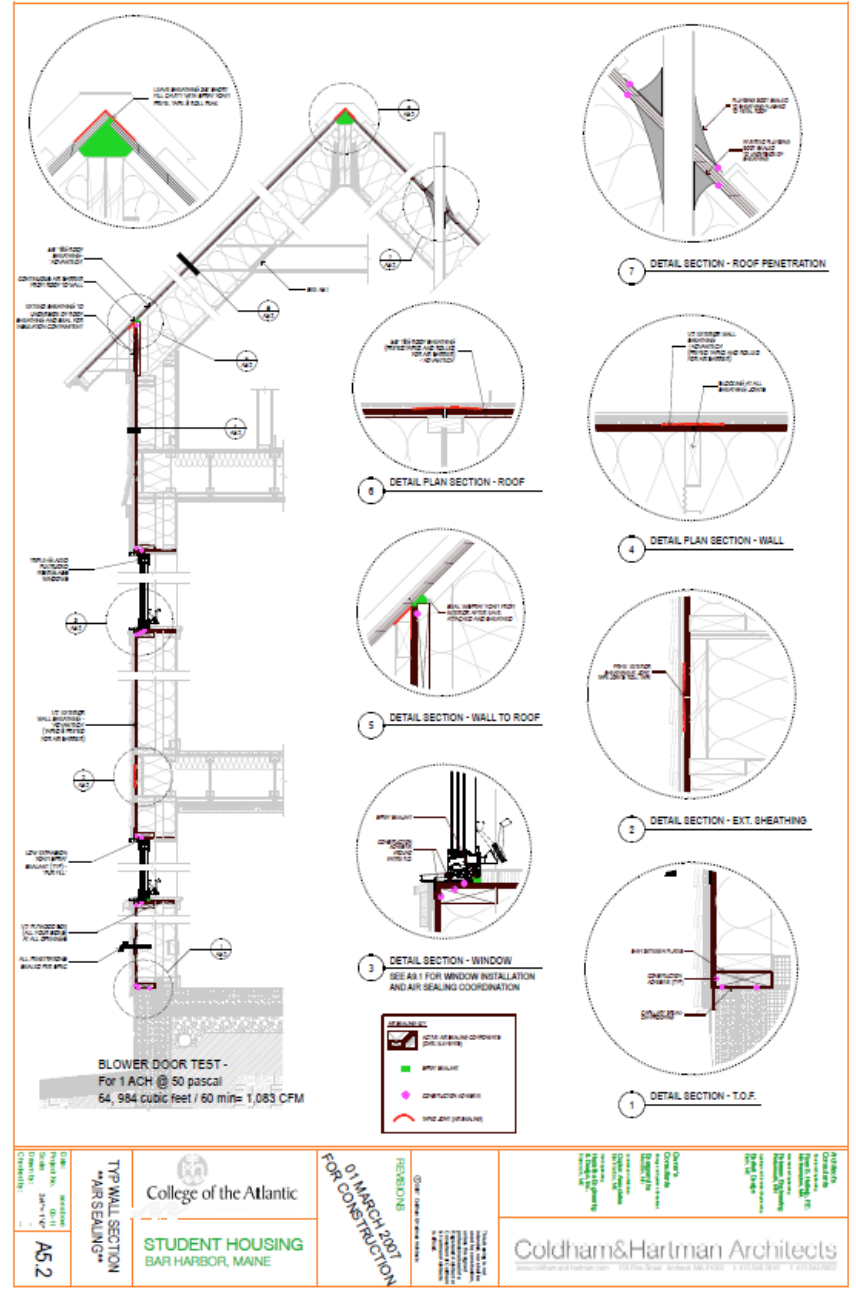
Continuous air barrier drawing (Courtesy of Coldham & Hartman Architects) (The drawing can be downloaded at <http://www.candharchitects.com/projects/college-of-the-atlantic-kathryn-w-davis-student-village/>; see link to "A5.2 Wall Section Air Sealing Drawing".)
